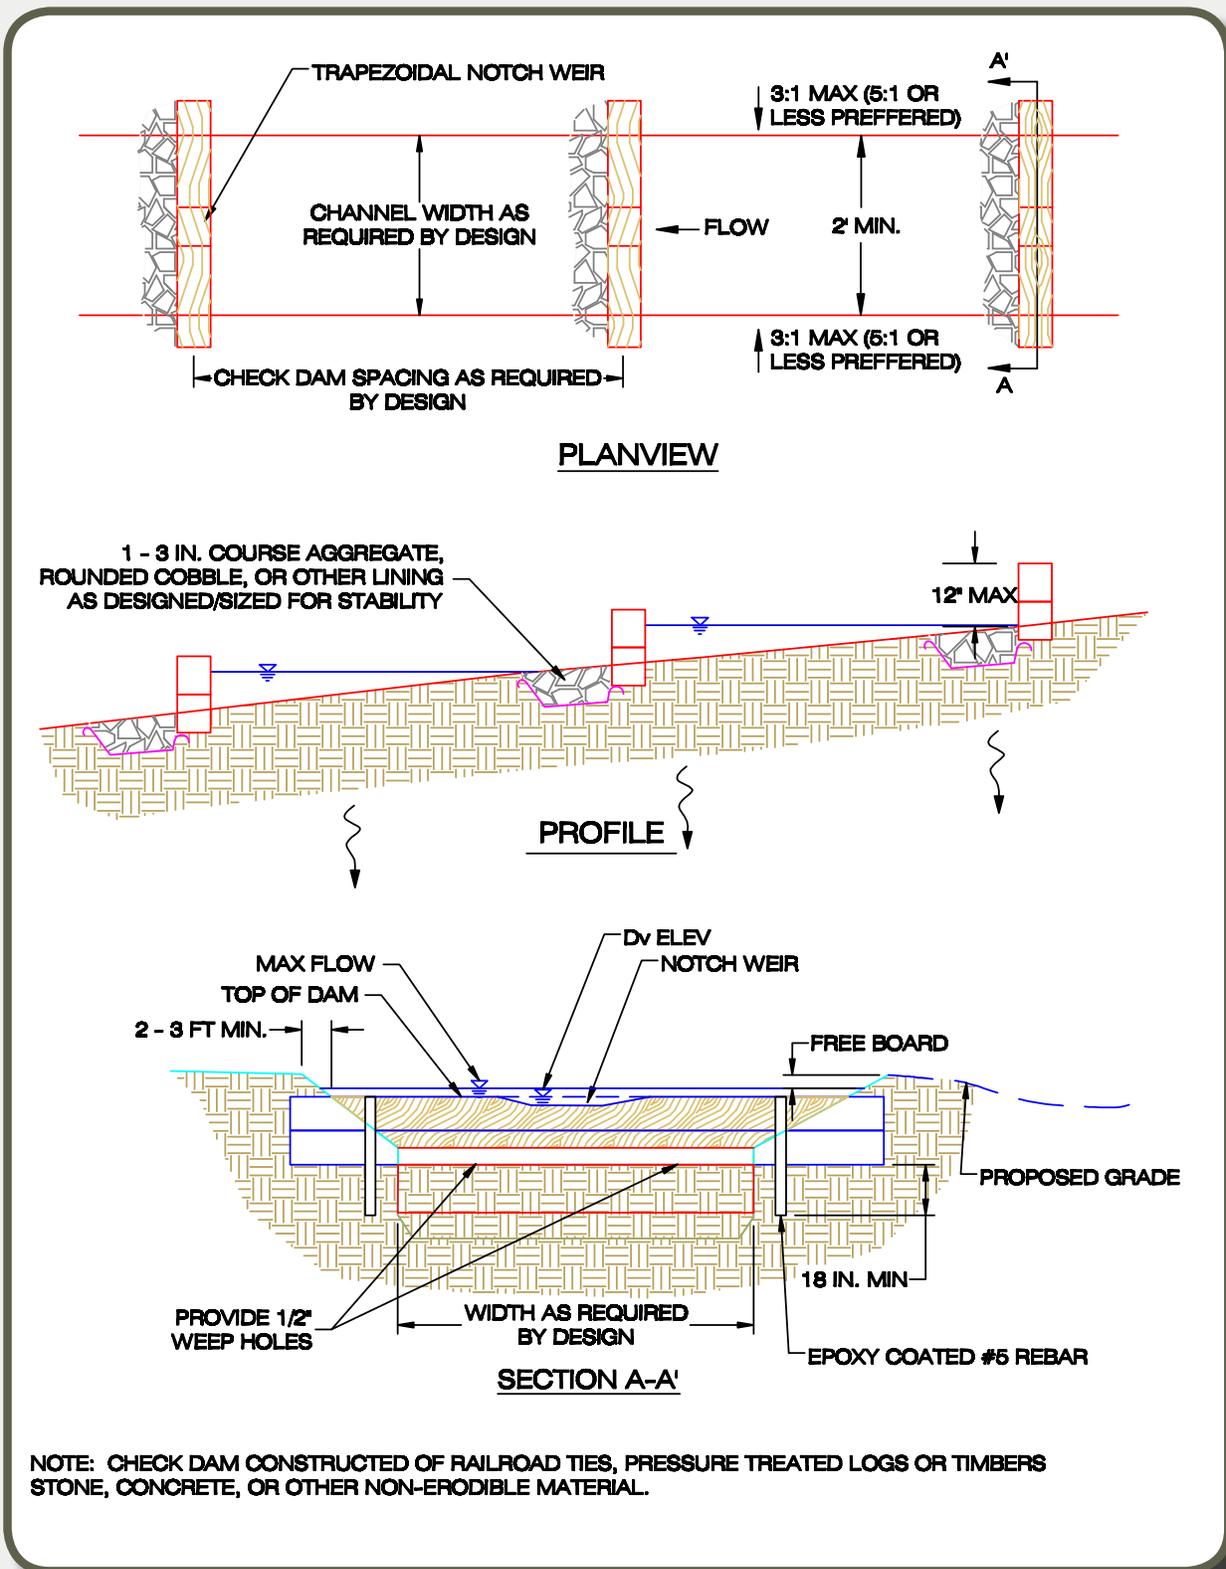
Typical Detail for Grass Swale with Check Dams
